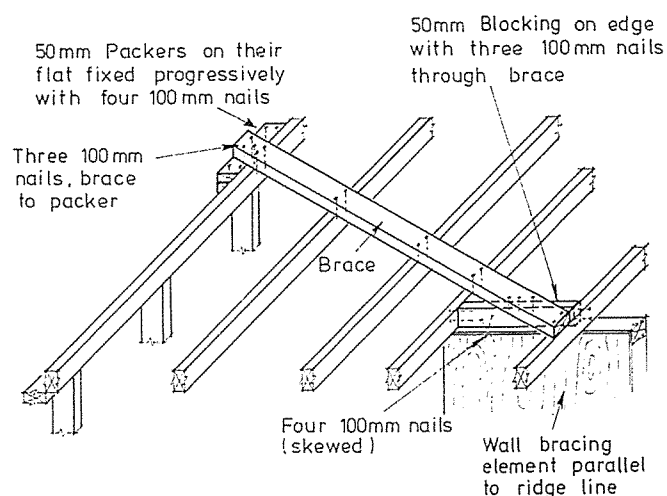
Ceiling braces connecting hip-end top plates to wall bracing elements
